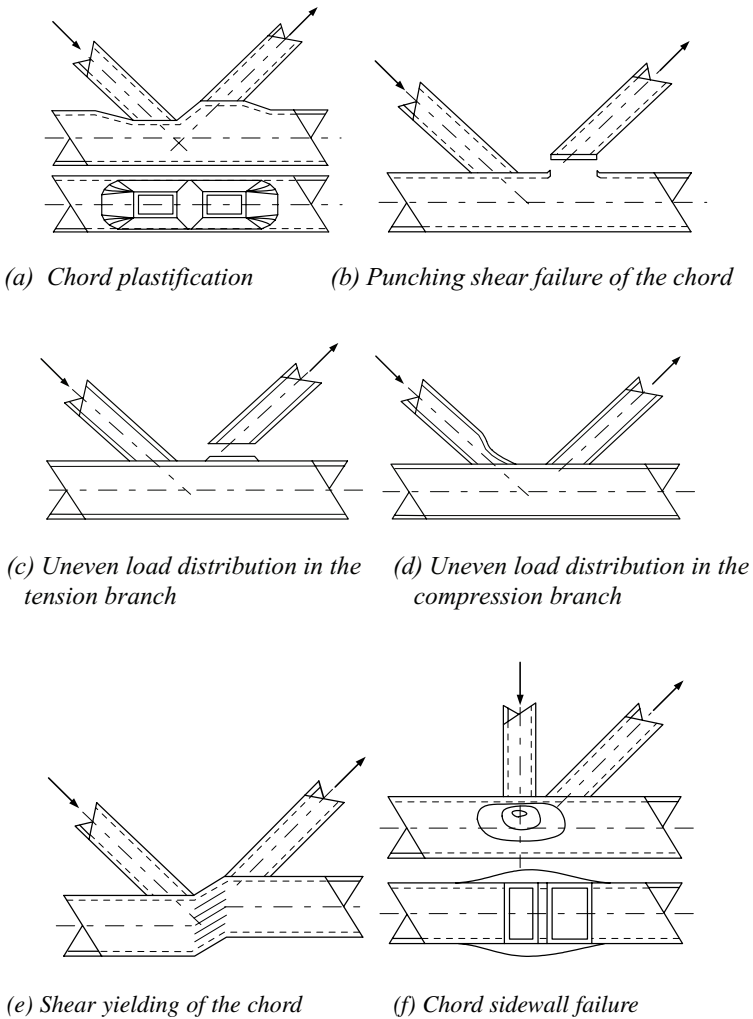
Typical limit states for HSS-to-HSS truss connections.
